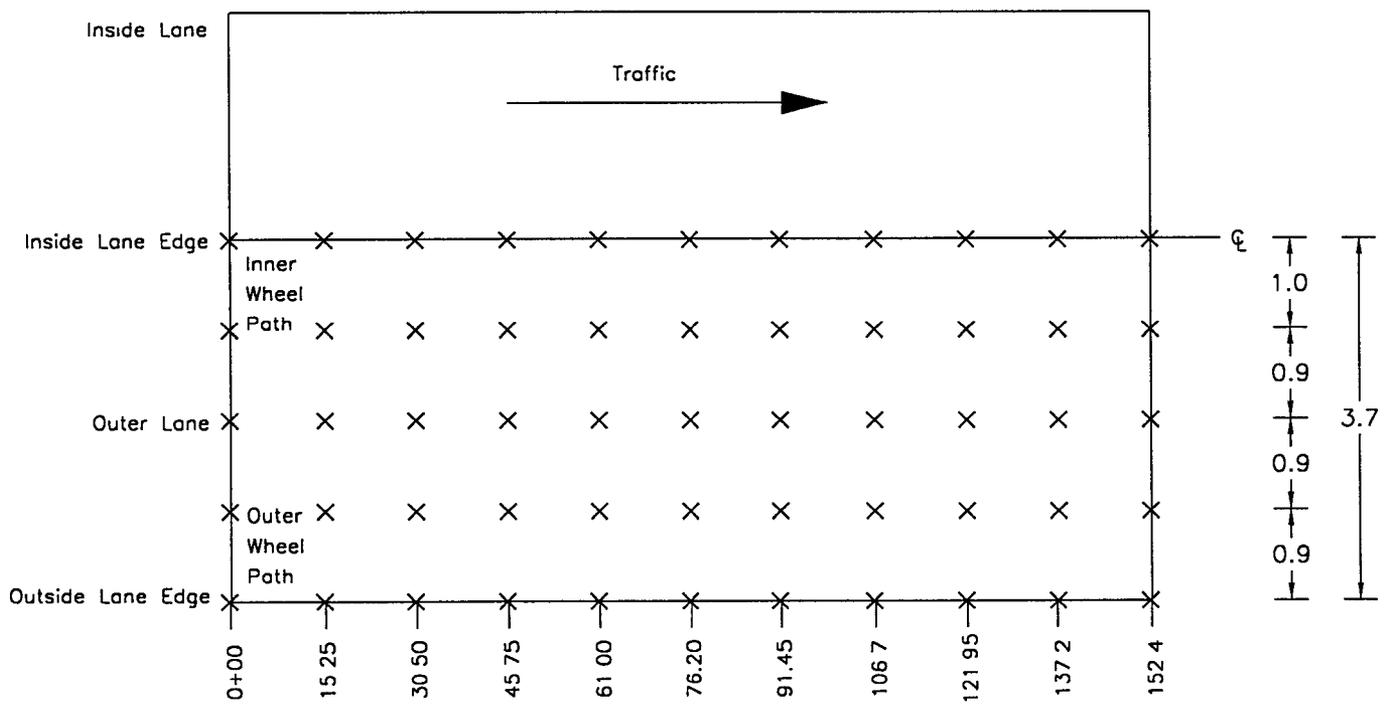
Test section elevation measurement locations for SPS-8 Washington
